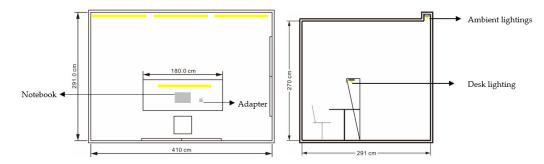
The layout of top-view and cross-sectional view testing space proposed in this study.
